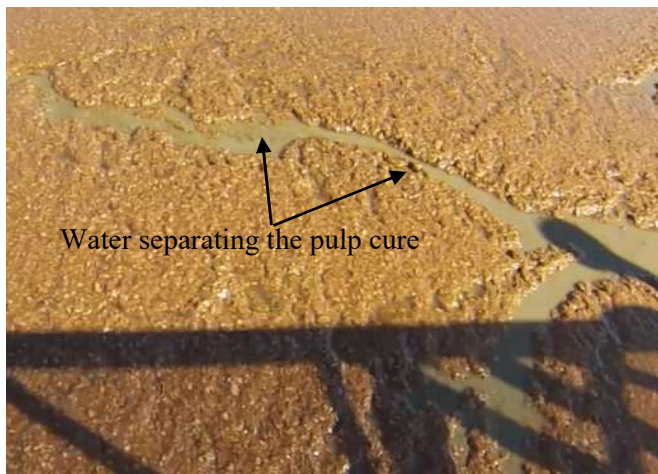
Photo from previous bridge deck coating shows water separating from the material leaving open channels, which will expose the surface to evaporation.
